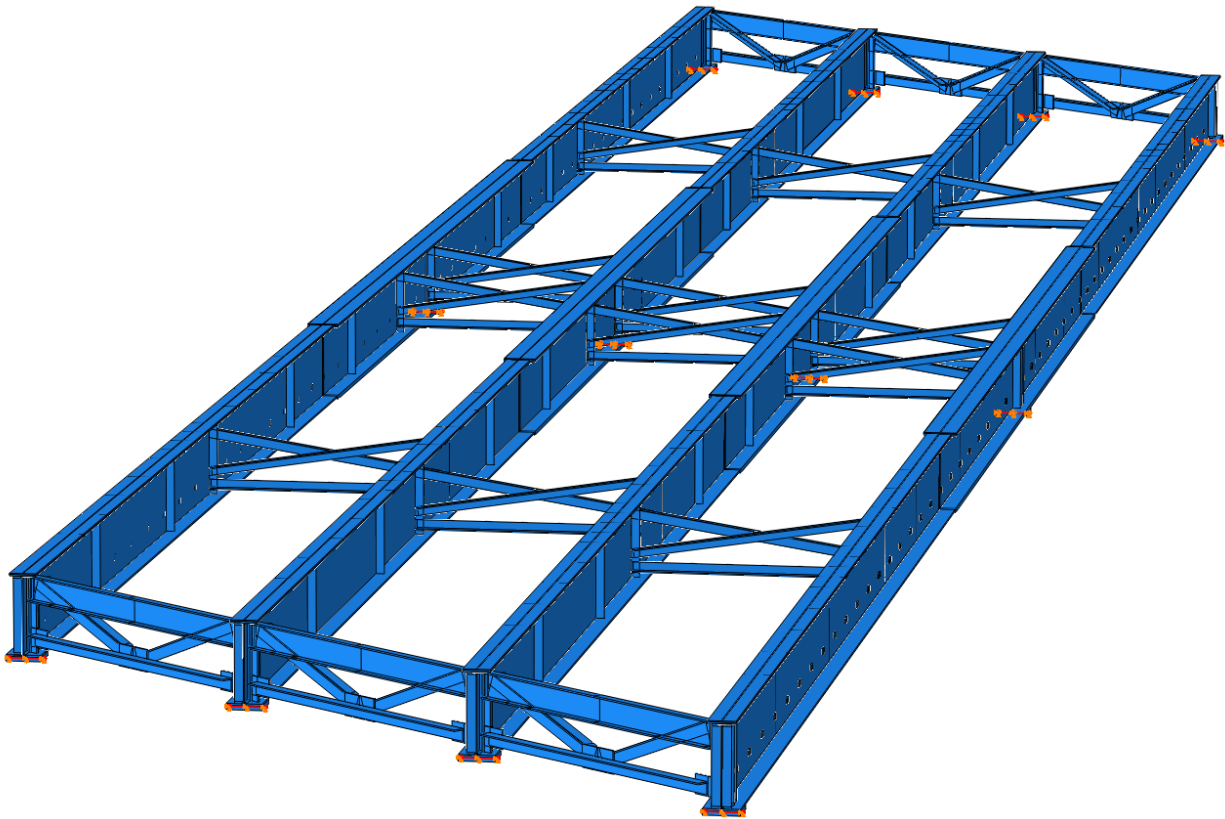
3D FEM model geometry of skewed-staggered bridge configuration (9.1 m [30 ft] cross-frame spacing)
